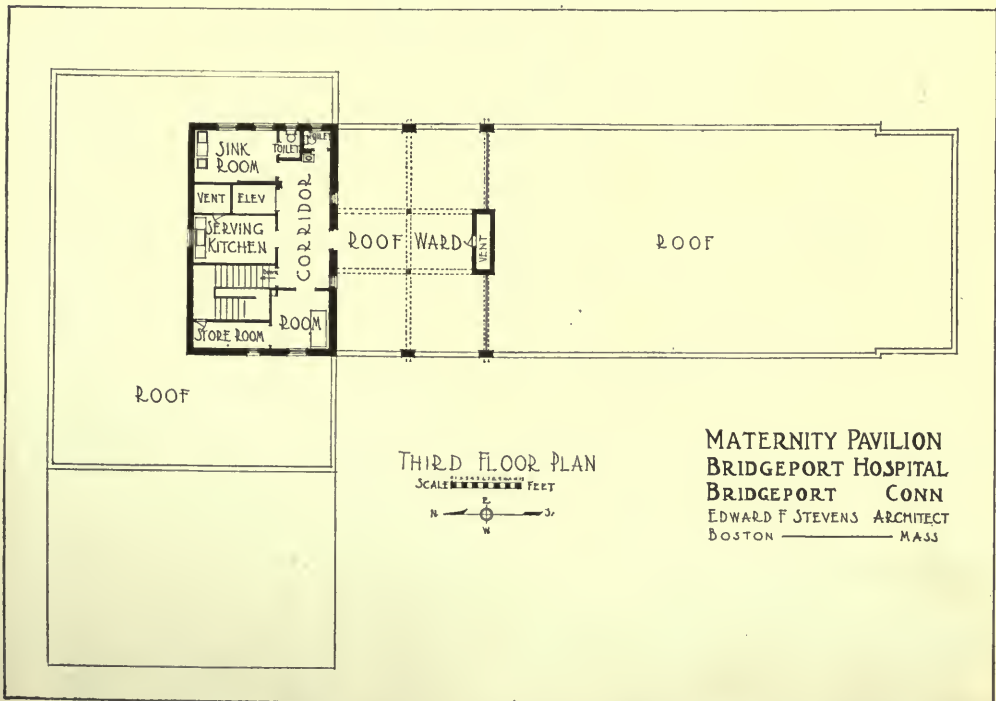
ROOF WARD—MATERNITY BUILDING, BRIDGEPORT (CONN.) HOSPITAL.
